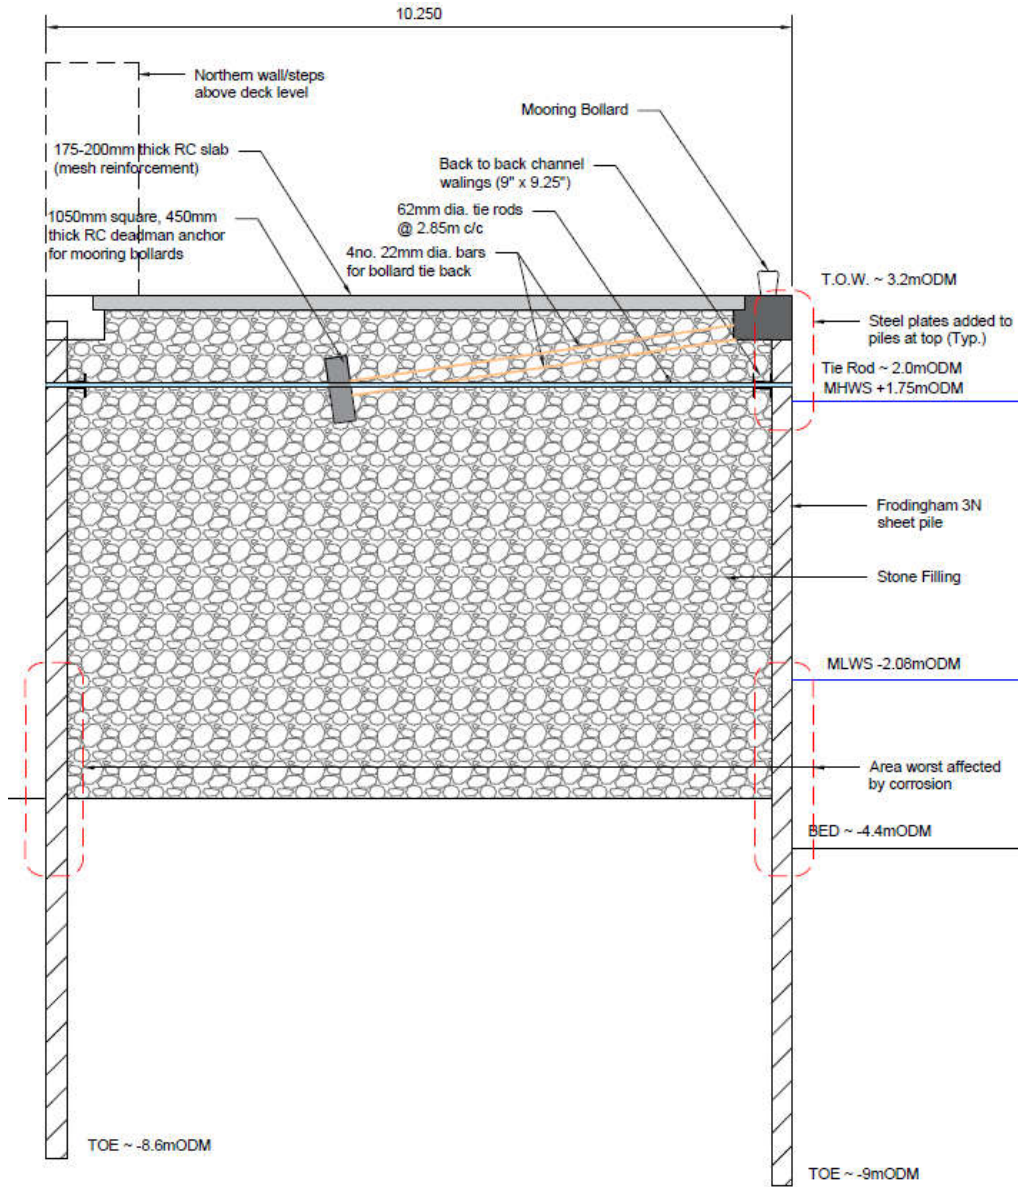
Typical Cross Section Through Existing Pier – Based on OPW Drawing
